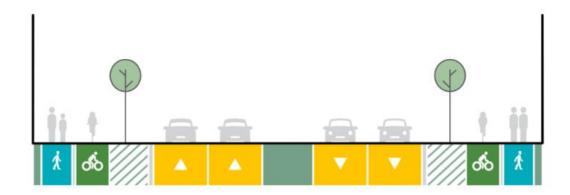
Indicative future Hobsonville Road corridor between Brigham Creek Road and Hobsonville Point Road
